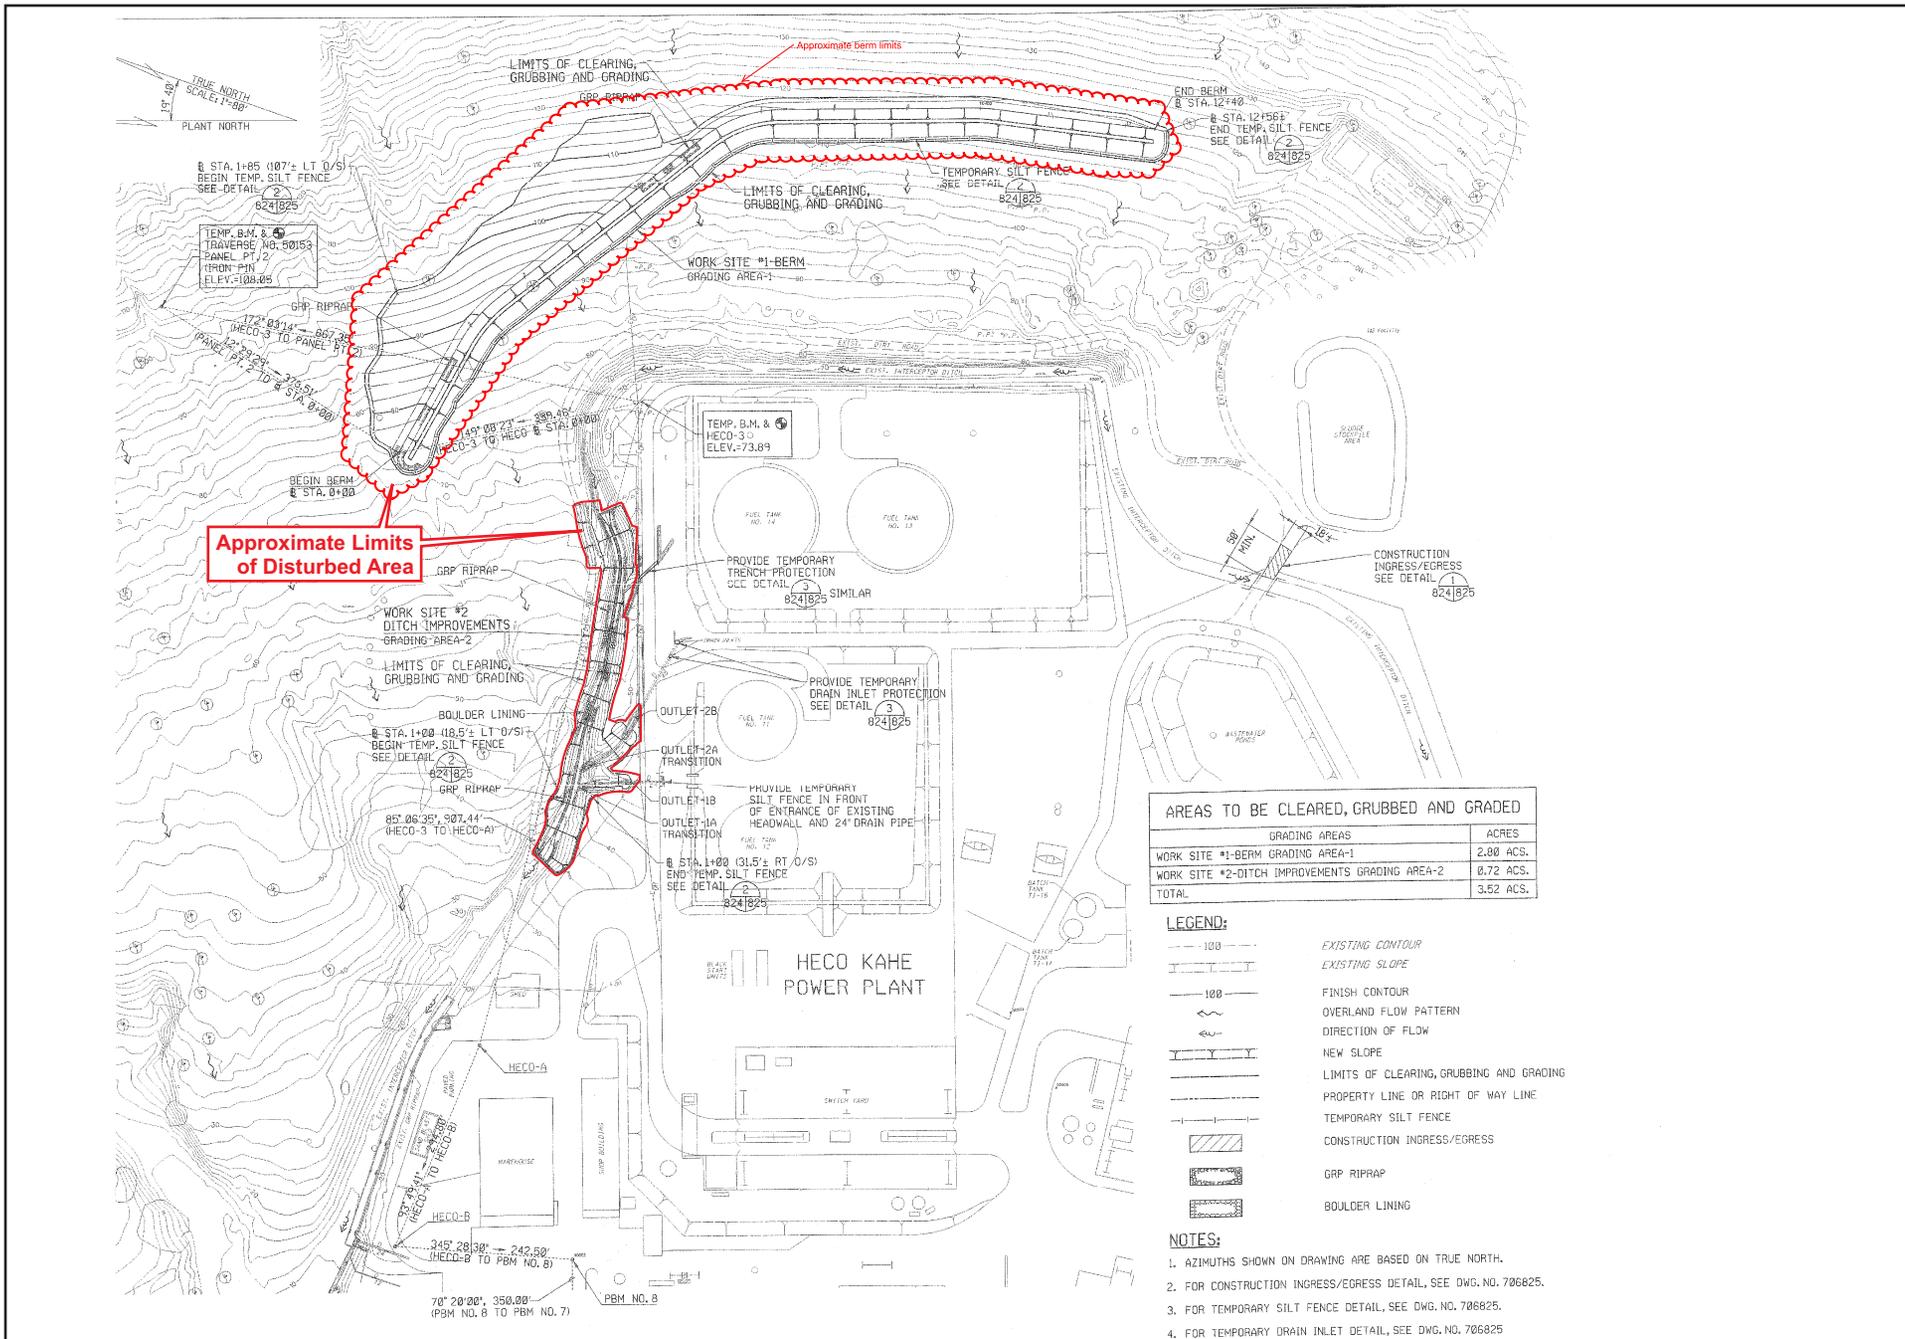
Site Plan of Proposed Storm Water Berm 2011-10-27.cdr
